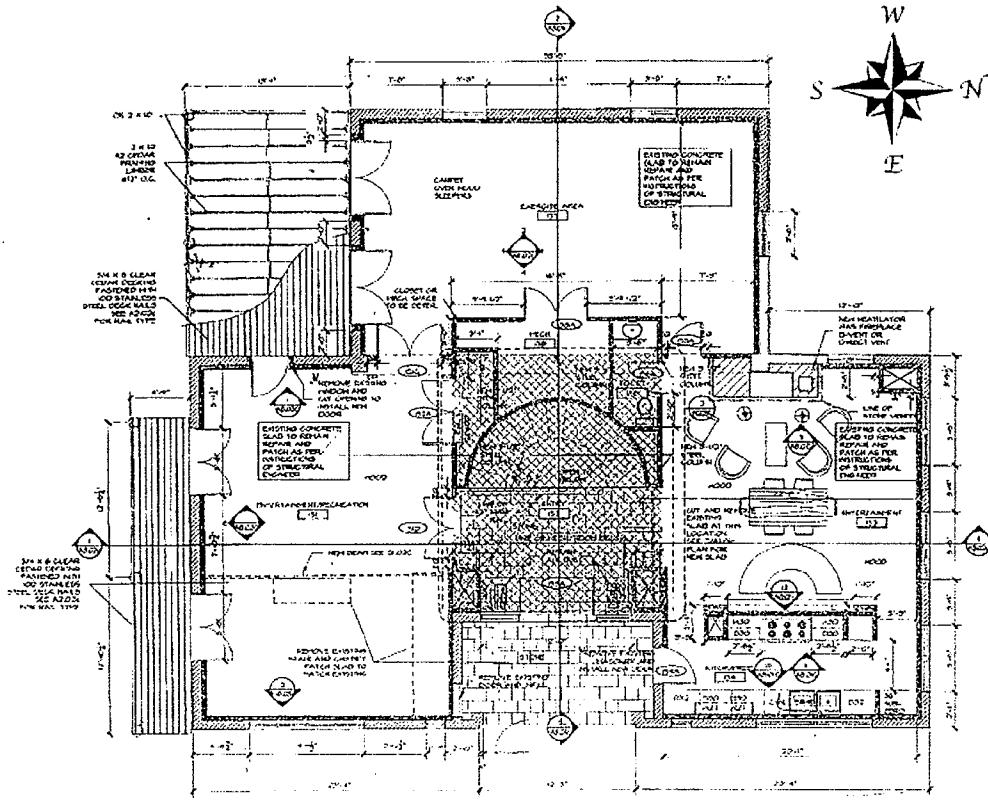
Plan view of first floor of building. The kitchen is located in the bottom right corner of the figure. The north side of the building is to the right of the figure.
